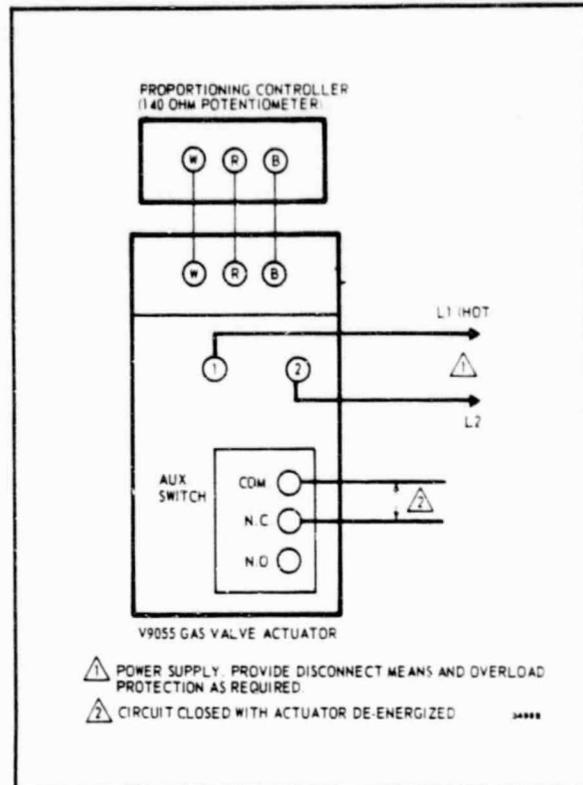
HOOKUP FOR THE V9055 MODULATING GAS VALVE ACTUATOR.
